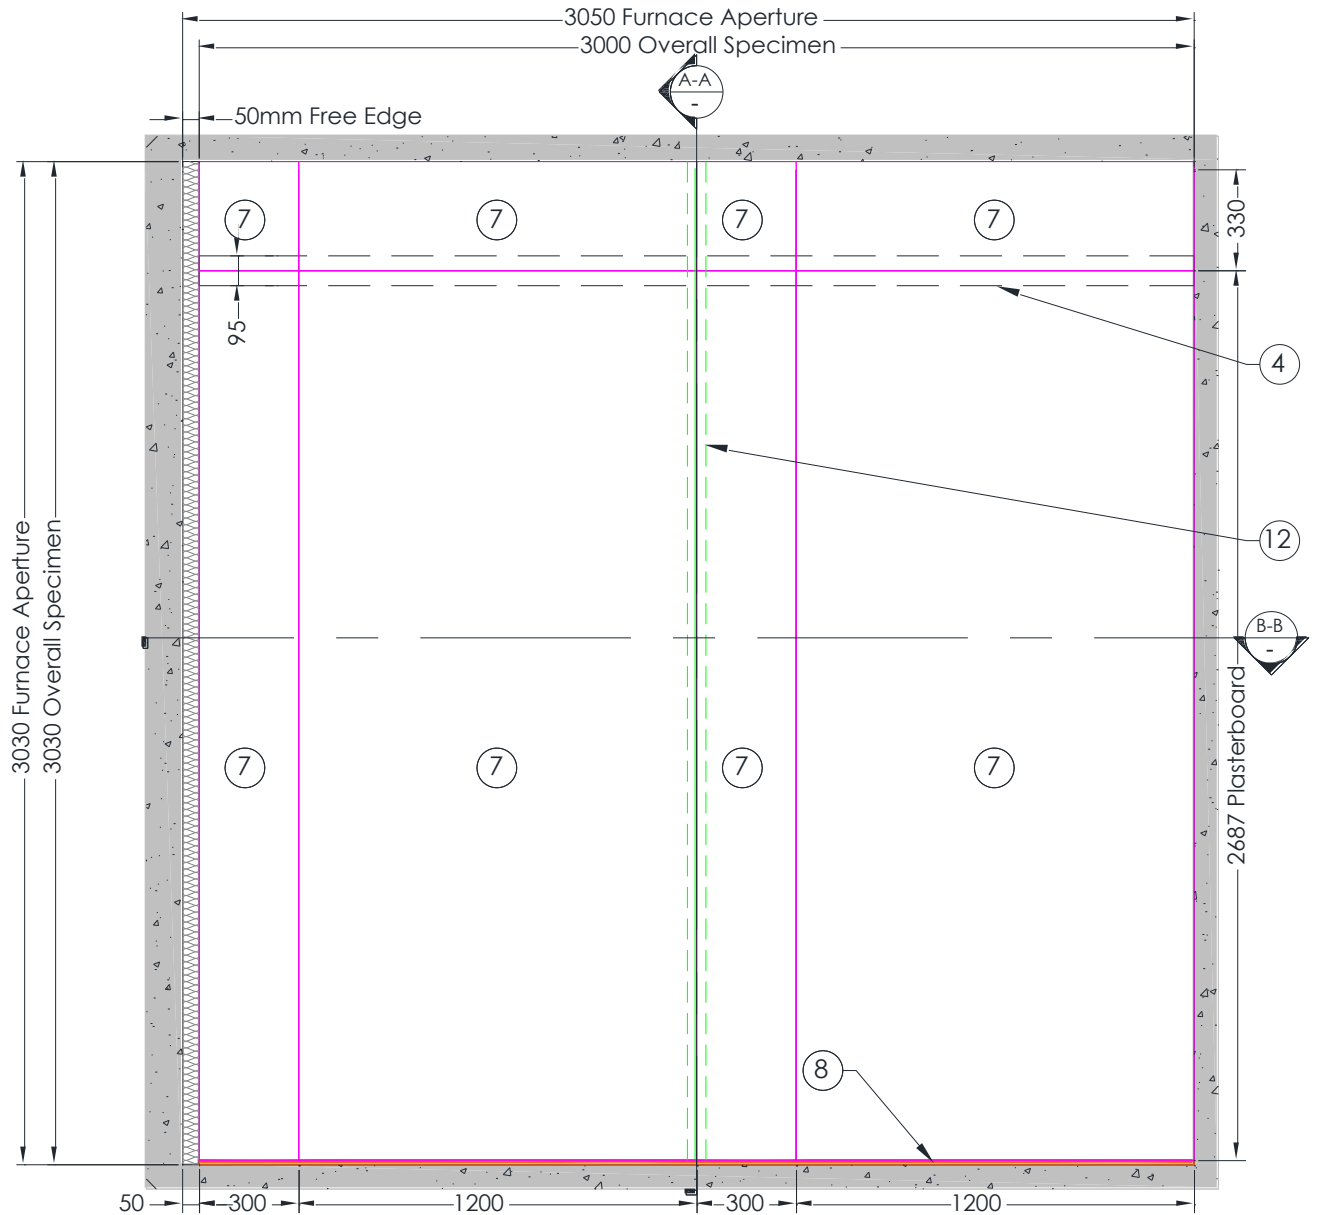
General Elevation Showing Plasterboard Layout & Thermocouple Positions - Unexposed face
